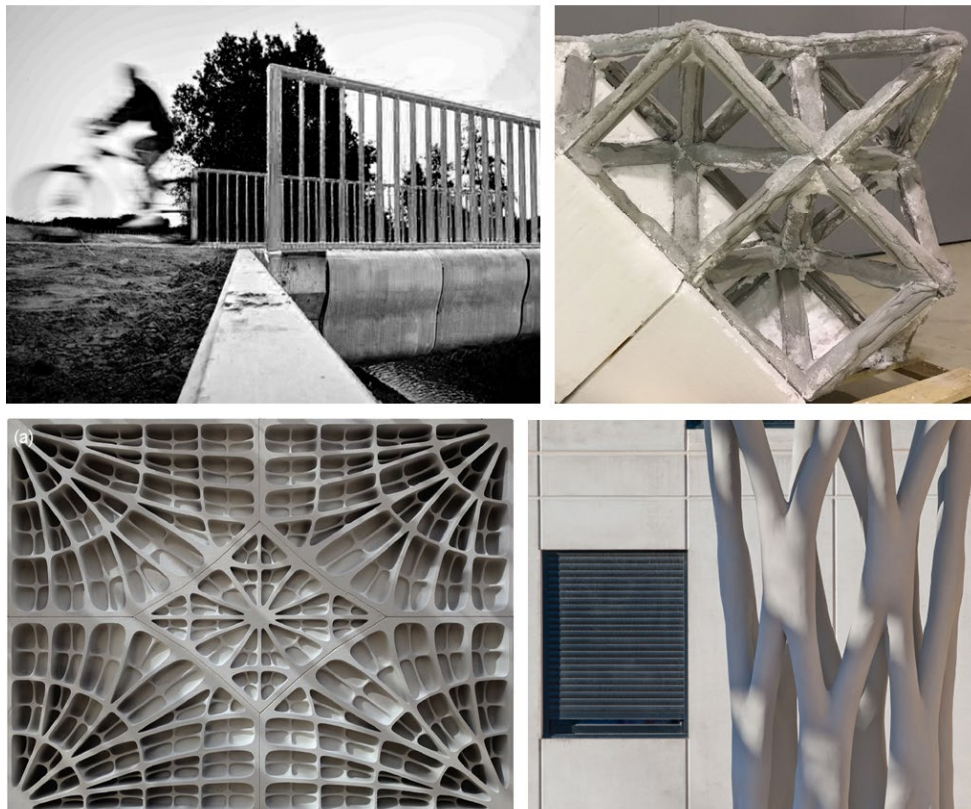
Building Systems re-designed with 3D Concrete Printing Technology:
